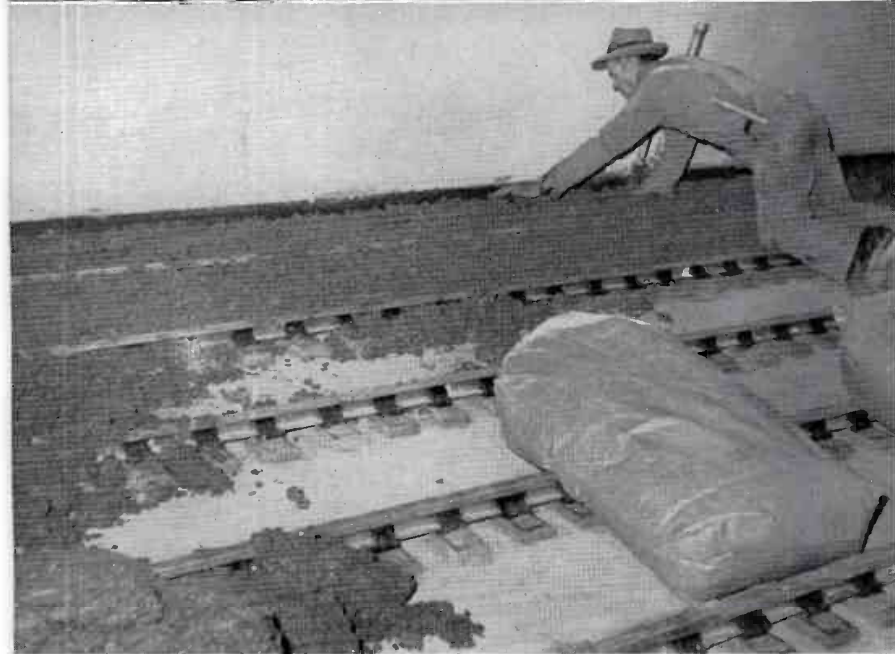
(left, center). Rock wool isolation fill is added between floating H sleepers. Heavy building paper, Hy-rib lath and wire mesh reinforcement supports 2½ inch studio floor slab on sleepers.
